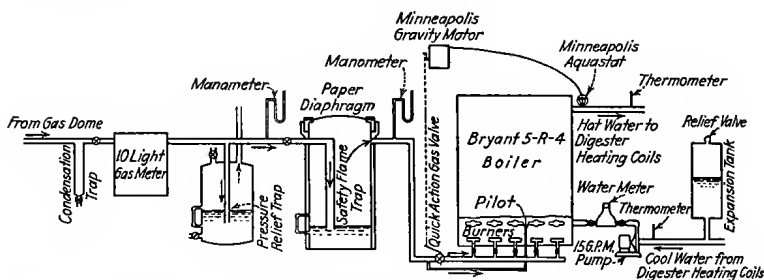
Diagram of gas piping and water-heating apparatus at sewage-treatment plant, Antigo, Wis.
